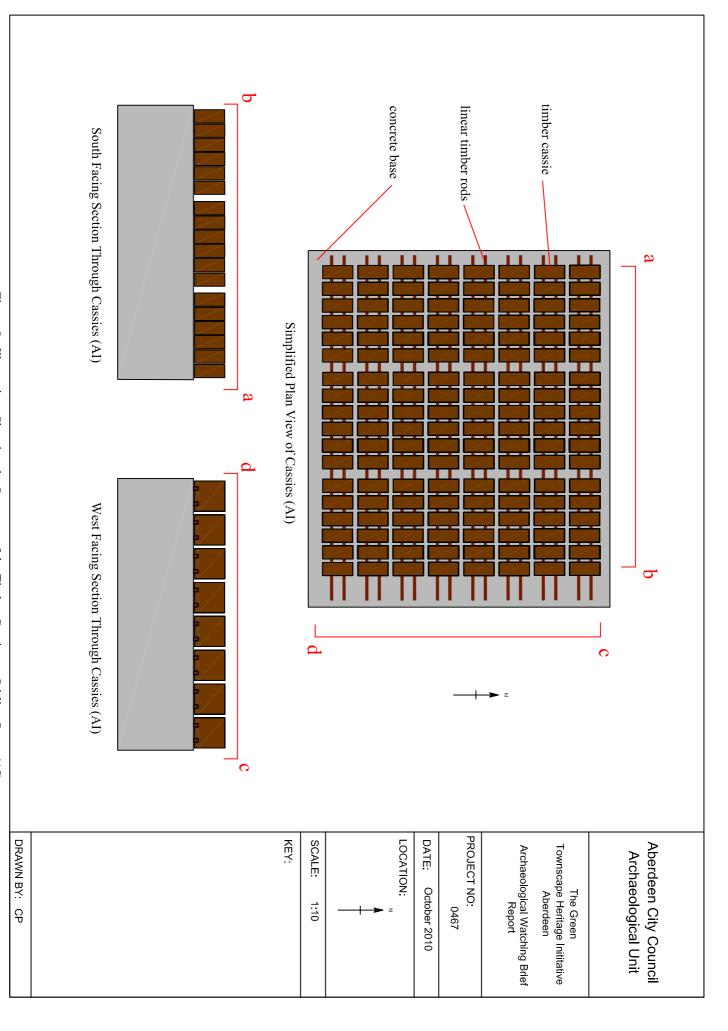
Illustrations Showing the Structure of the Timber Cassies on Stirling Street (AI)
